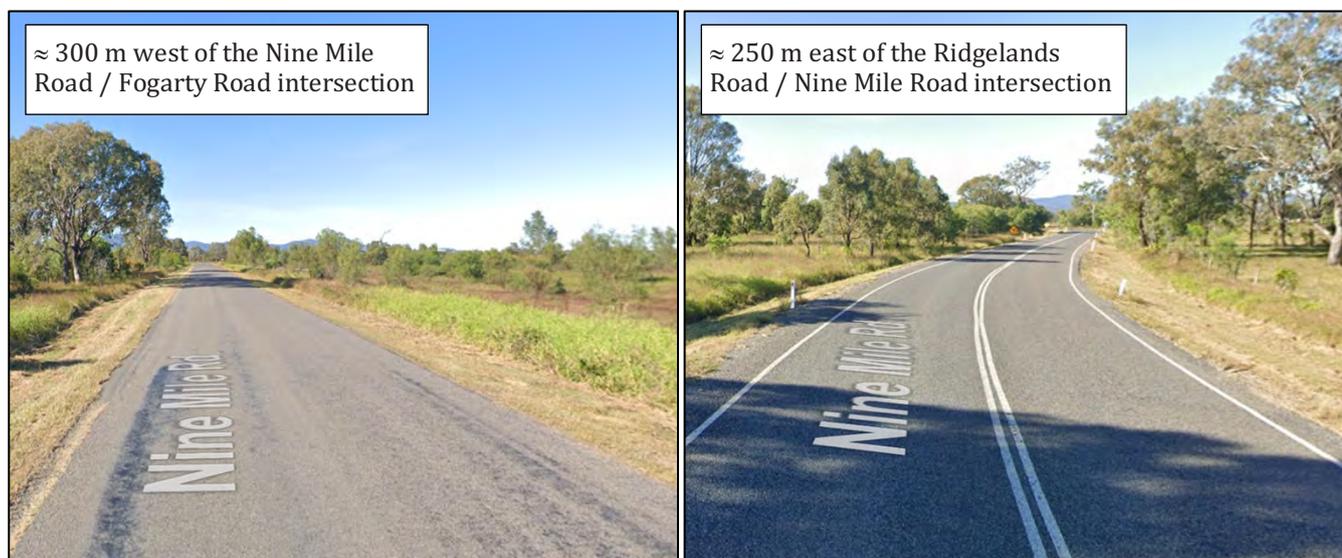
Nine Mile Road pavement conditions in year 2022 at various locations [Source: Google Street View]
